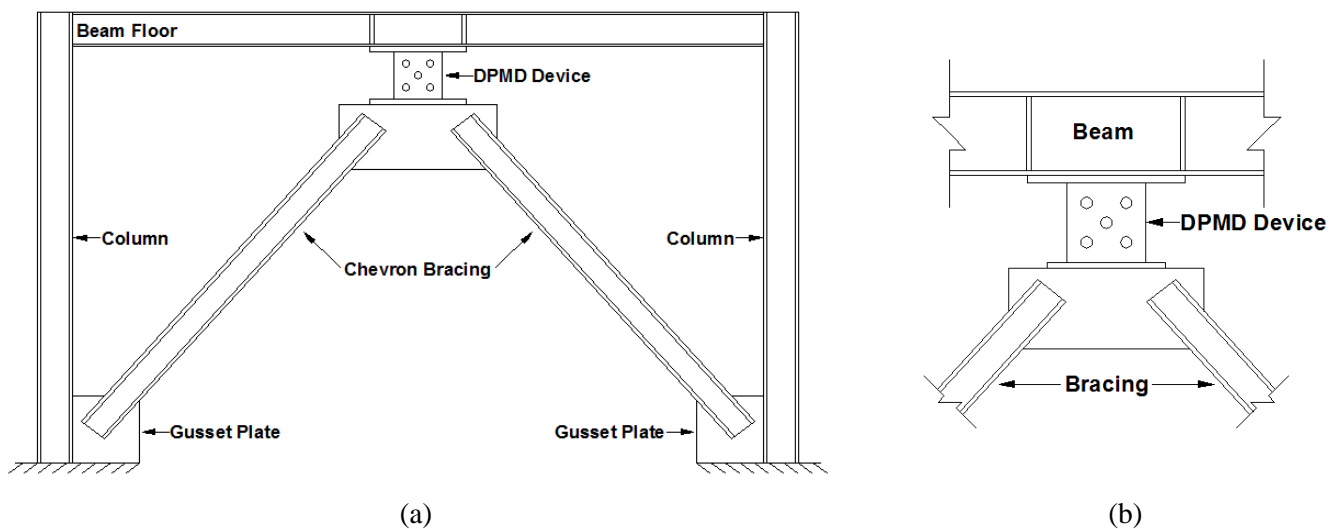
a) Frame system and DPMD position, b) Connection of DPMD to beam and bracing
